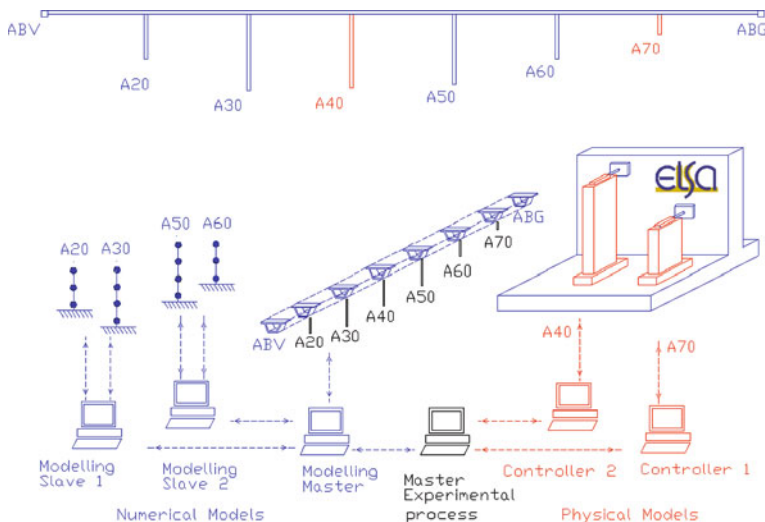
PSD testing with substructuring – application to bridges: test setup
